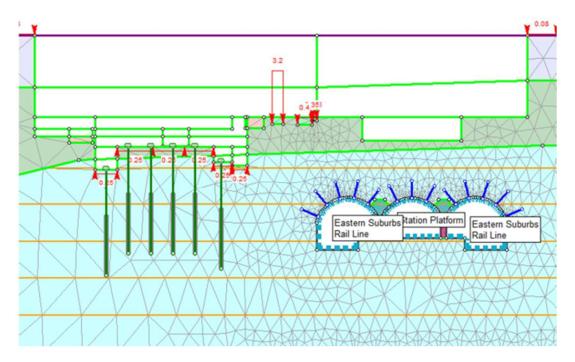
Geotechnical model for the section adjacent to Martin Place Station
